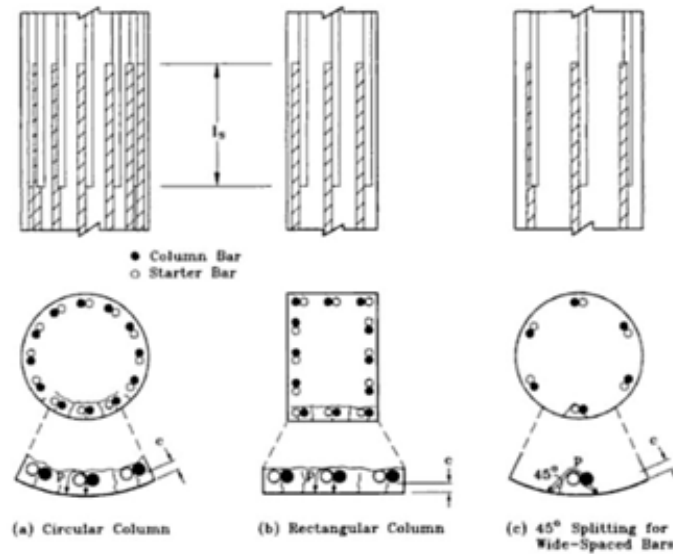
Lap-splice failure of longitudinal bars in columns [51].
